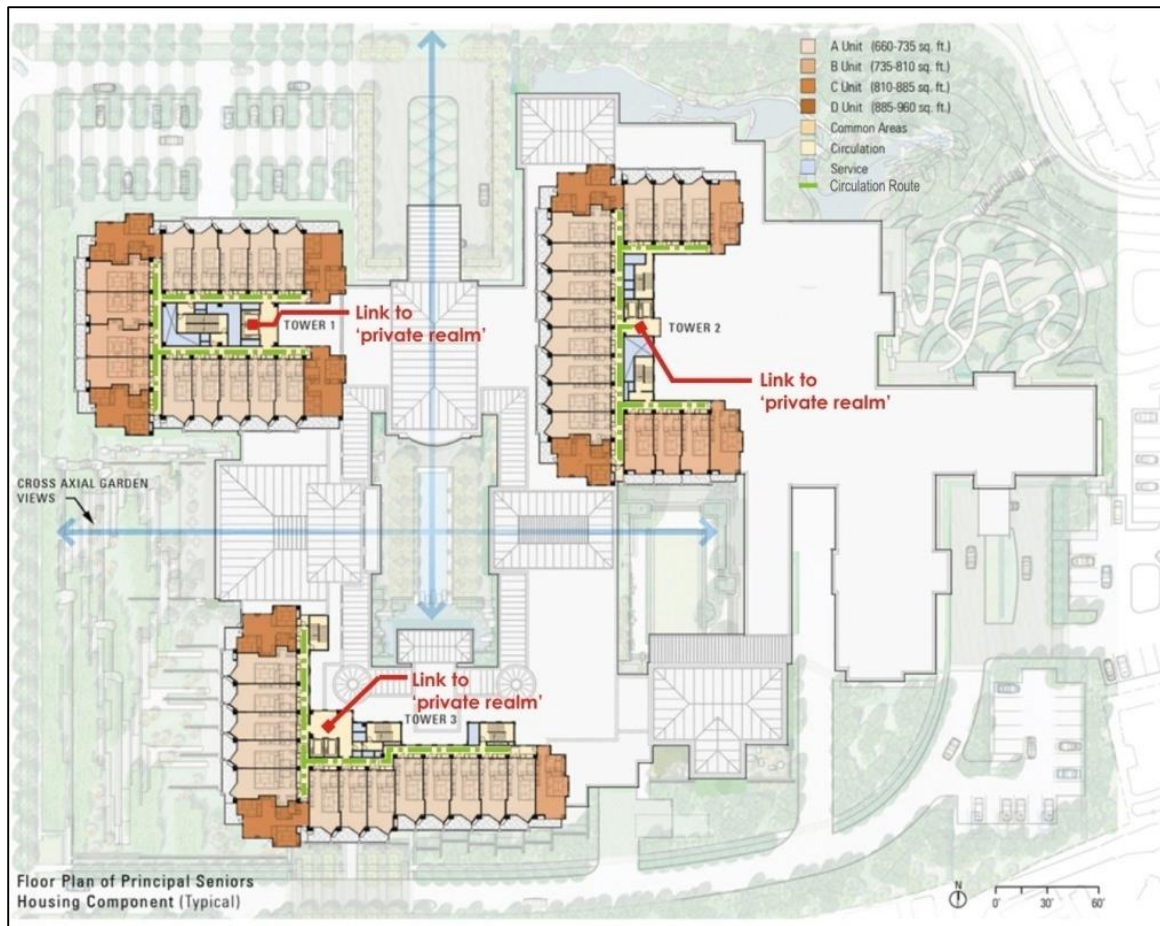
First Floor Plan of residential zones located in the three towers. (adapted from - www.bararch.com)
